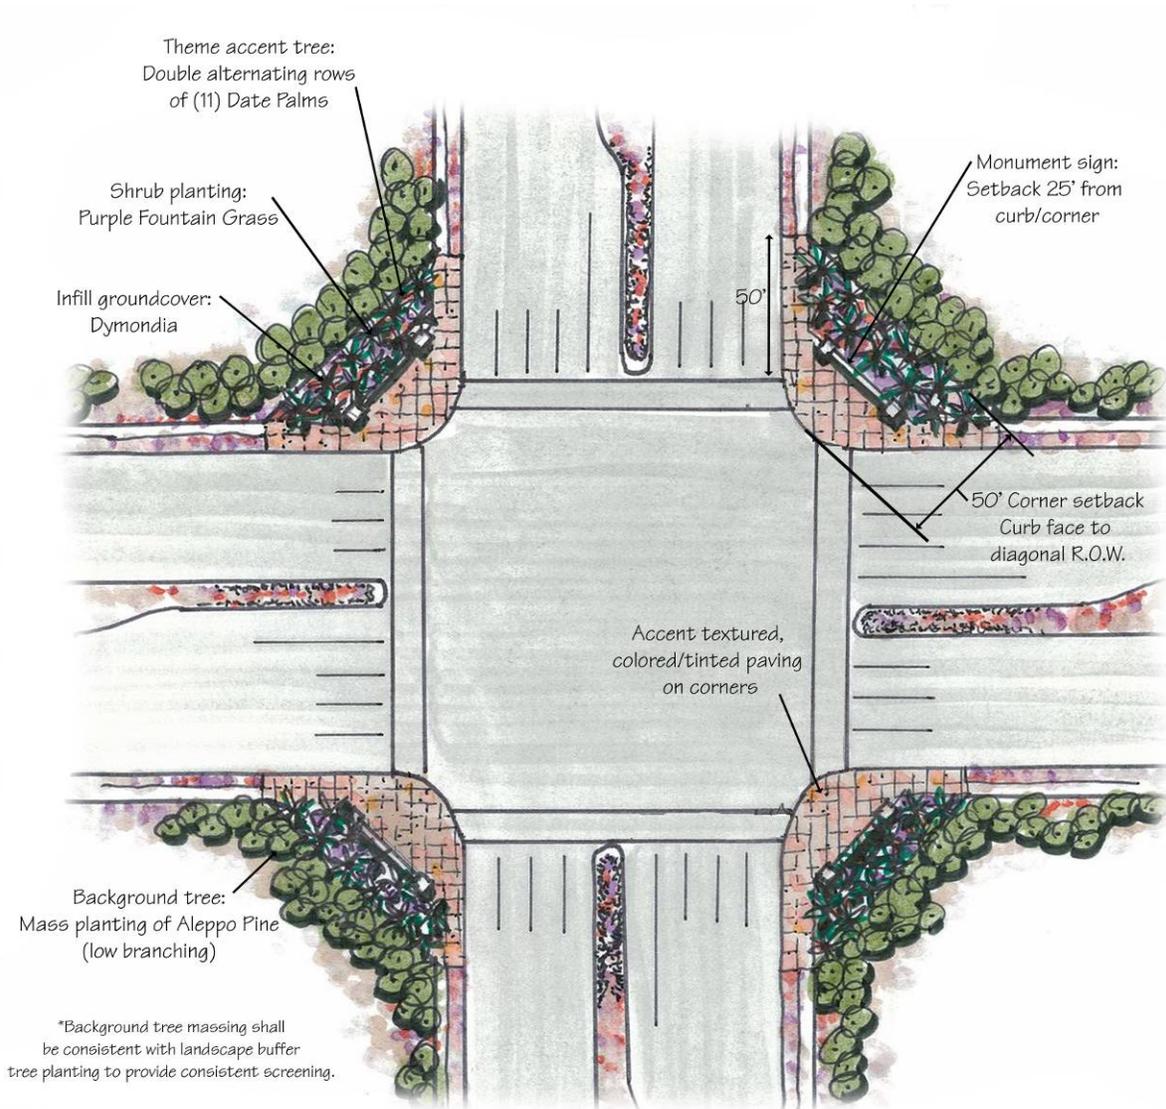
Primary Gateway Intersection Enhancement Concept
